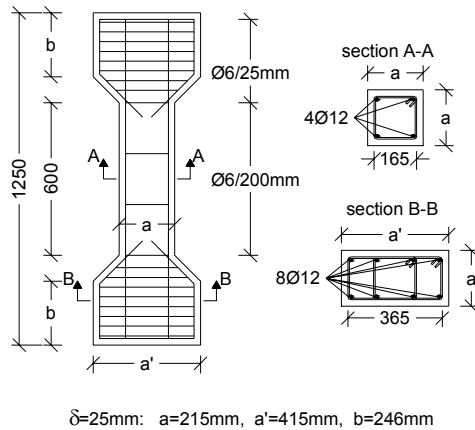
Geometry and reinforcement of the specimens tested in this project.
